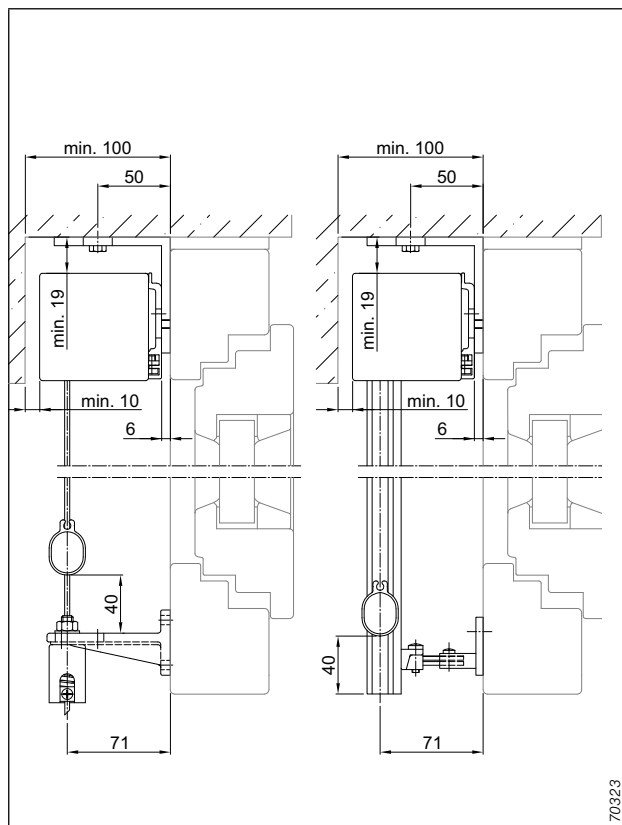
Vertical awning 470, right rolling blind, ceiling installation
